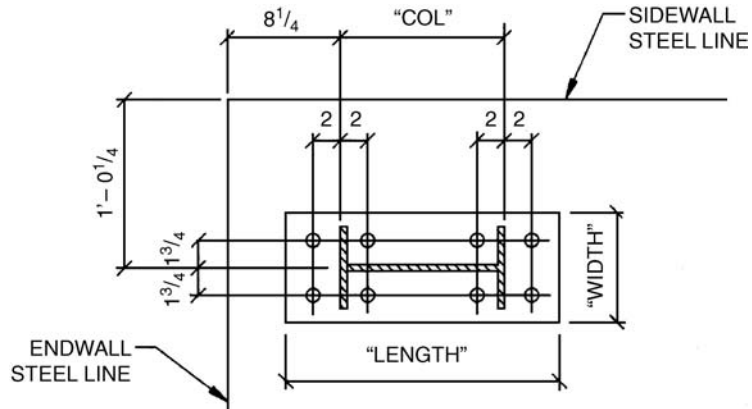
Anchor bolt layout for a fixed-base column. (*Metallic Building Systems.*)
